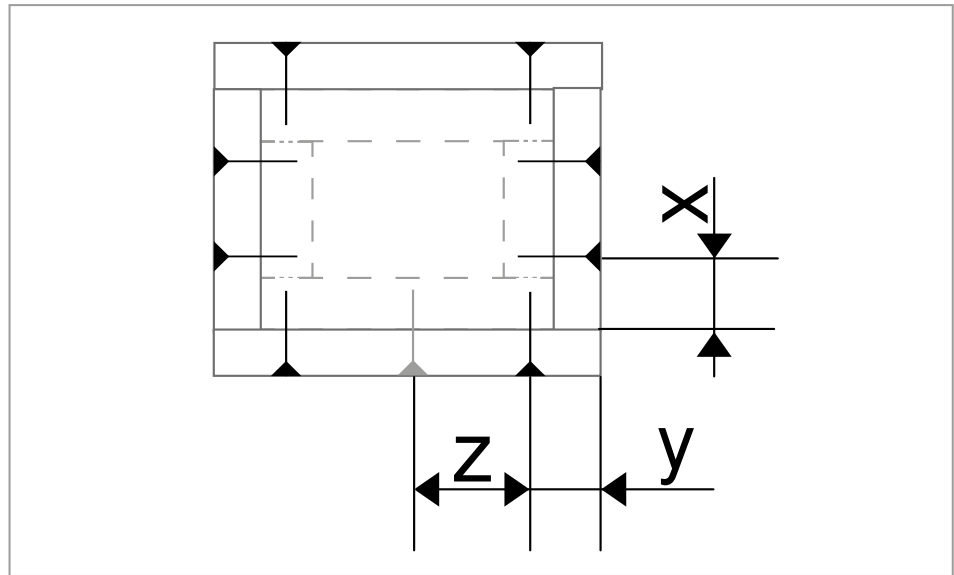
Position of drilling holes for PLCS... wall connection collar
